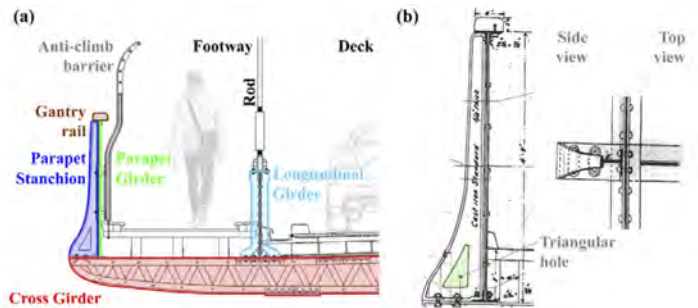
(a) Partial cross-section of the bridge. (b) Side and top views of the parapet stanchion.
